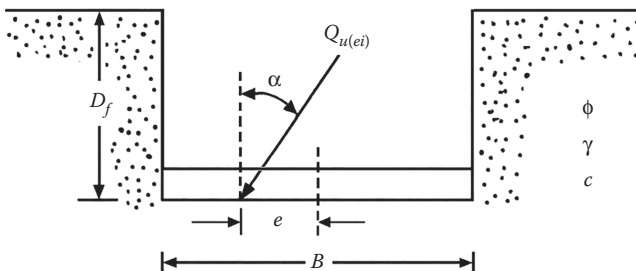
Continuous foundation subjected to eccentrically inclined load.
